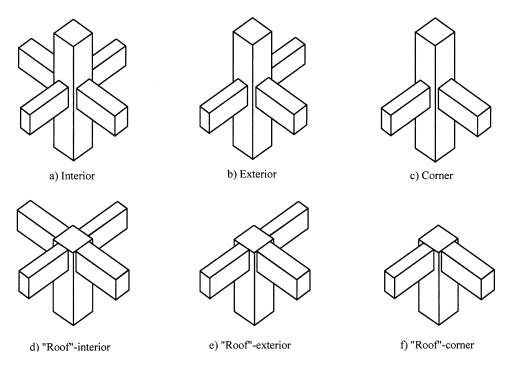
Typical beam-to-column connections (slabs not shown for clarity). Wide-beam cases not shown.
